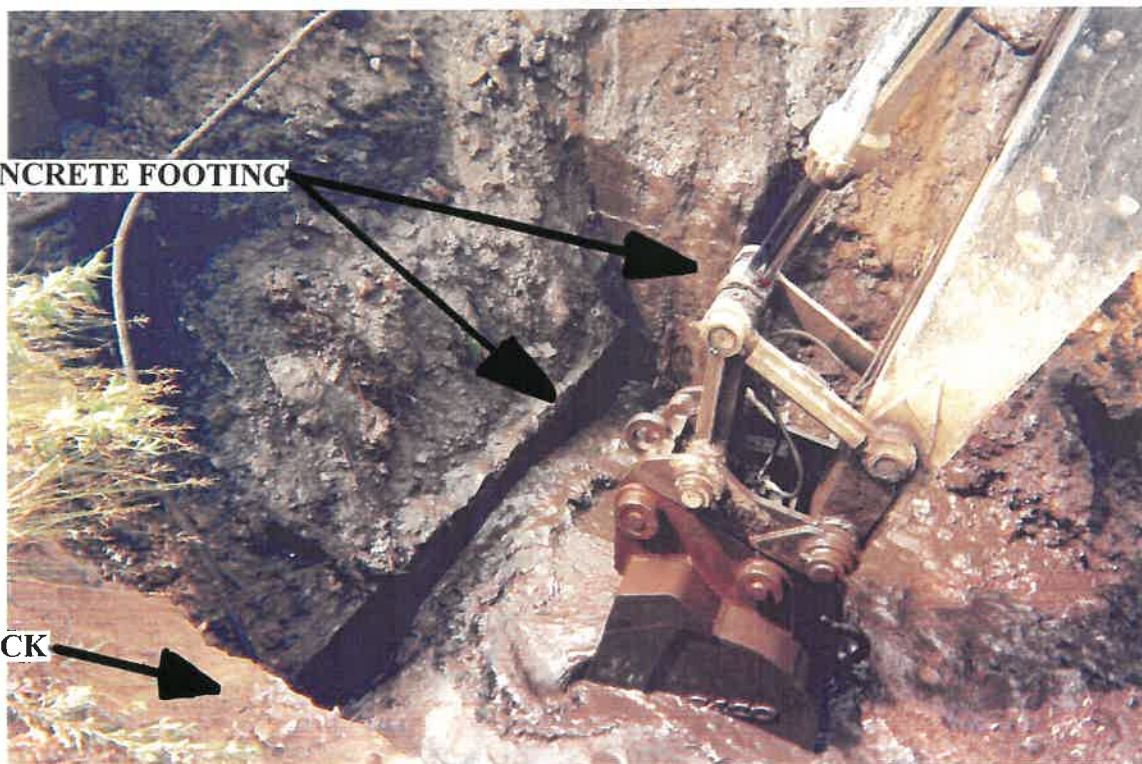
View of northeastern portion of test trench #2 (TT-2) standing approximately 100' east of boring WC-10 looking southwest. View is 180 degrees from view in photo 12. Timber piles were found under concrete footing, which supports dock.
